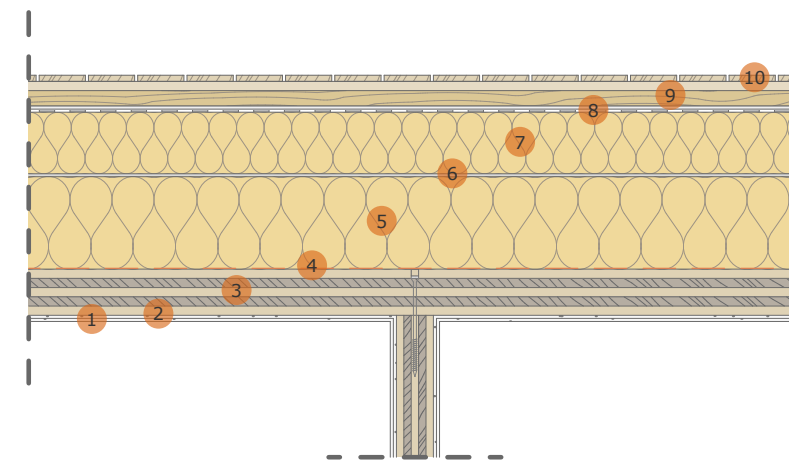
DETAIL EXTERIOR WALL/BUILDING ENVELOPE
